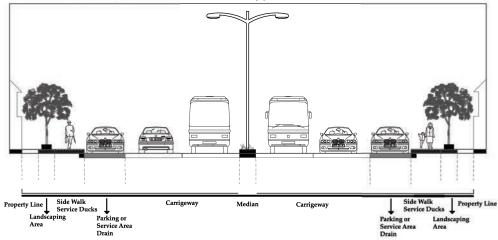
Cross section of a Level 01 – General Road - (Road Type - 1-A)
